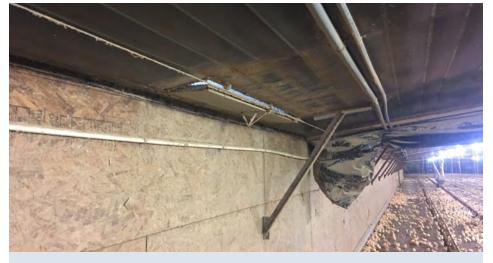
Two electrical conduits running parallel to ceiling air inlets will trip the cooler incoming air stream before it gets a chance to mix with warmer air as it enters the house.
